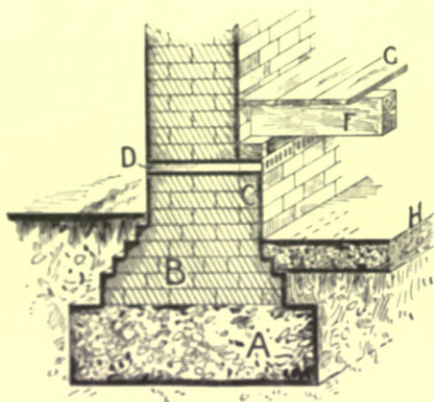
Brick and Concrete Foundation for 18-inch Wall.
